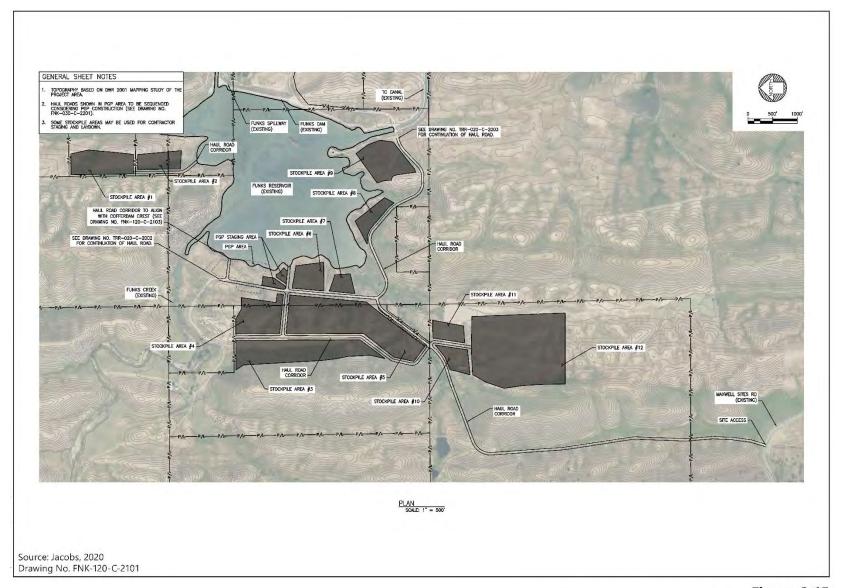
Funks Reservoir Stockpile and Haul Route Plan
